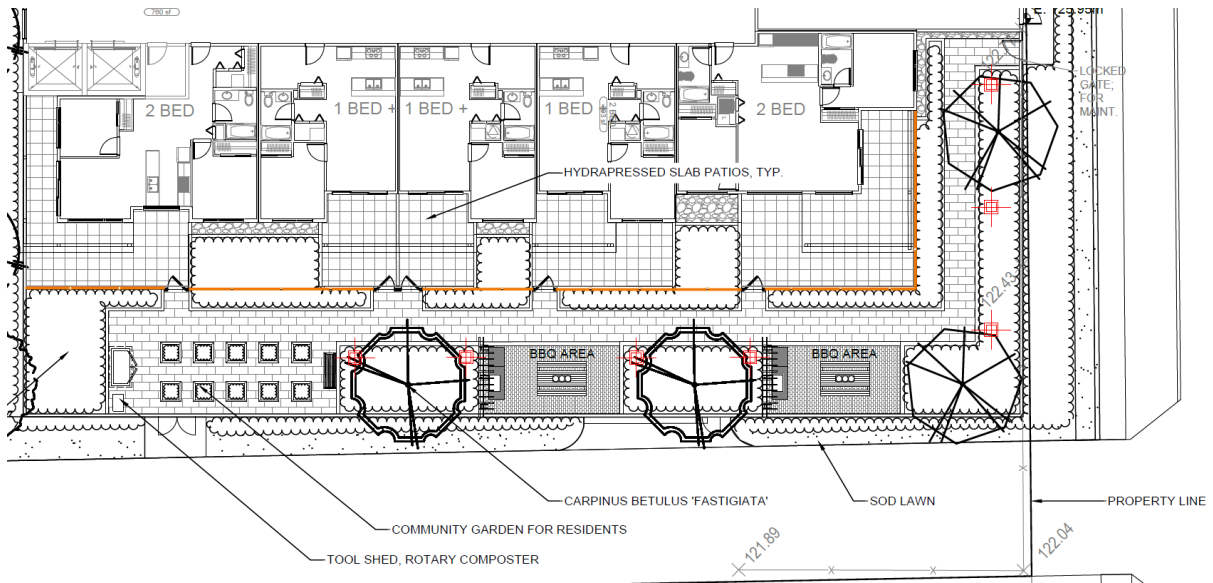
Excerpt of the Landscape Plan, showing the outdoor amenity area
